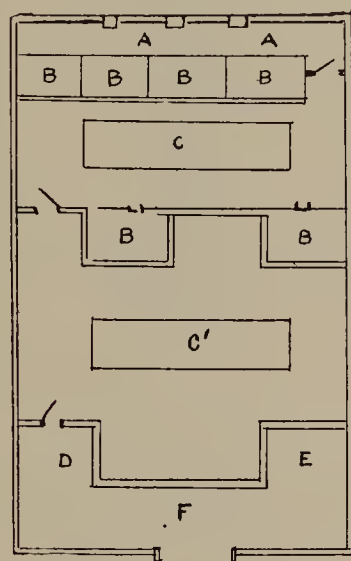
Sketch plan of a typical Benin house by Mr. C. Punch.
